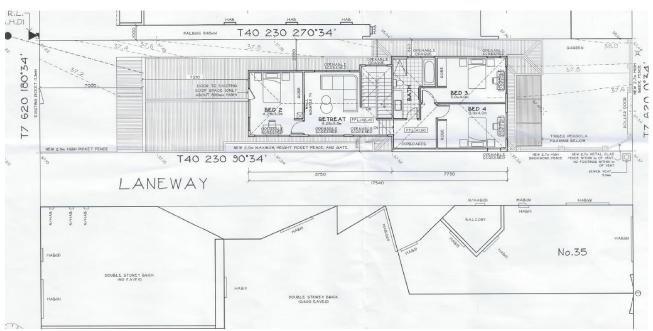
The first floor plan of 31 Berry Street as approved under planning permit PLN13/0803
